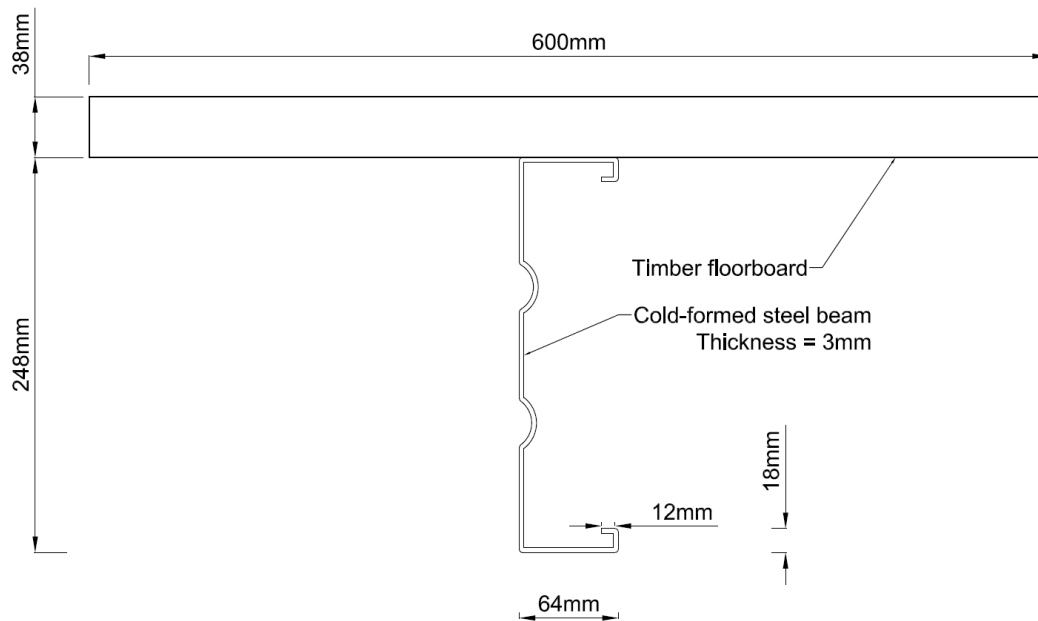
A typical domestic raised floor system using cold-formed steel joists [15].
